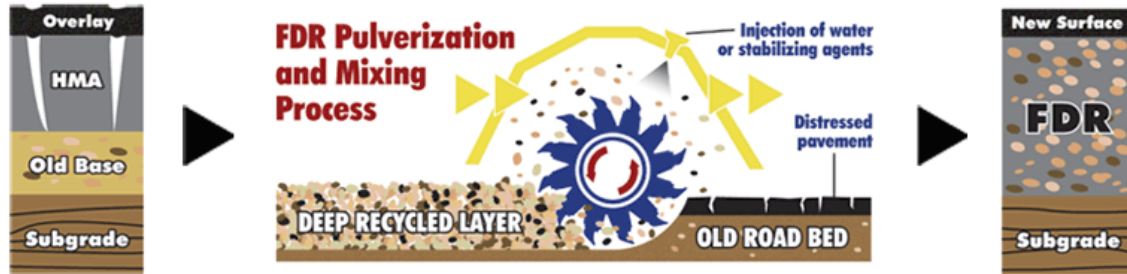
Full-Depth Reclamation (FDR) (Source: American Road Reclaimers)
